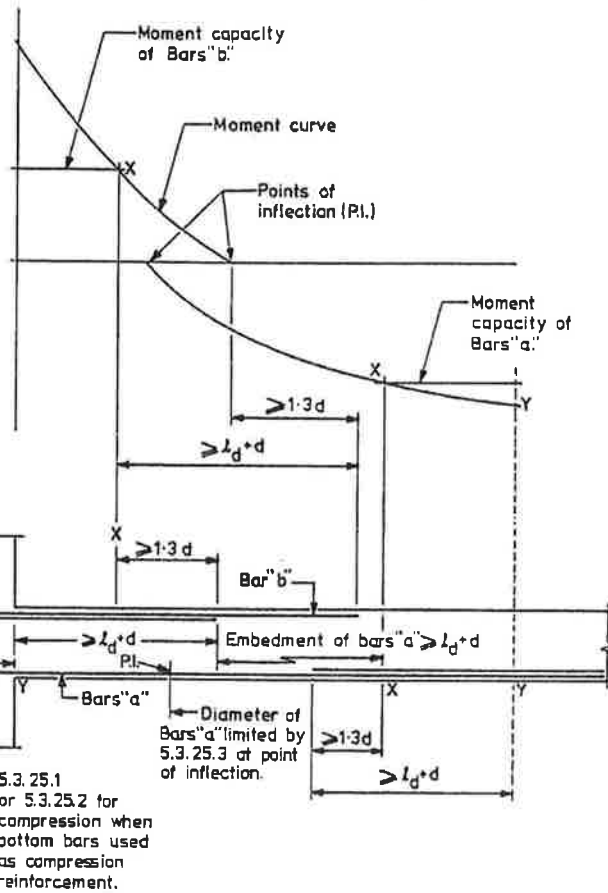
DEVELOPMENT OF FLEXURAL REINFORCEMENT IN A TYPICAL CONTINUOUS BEAM
